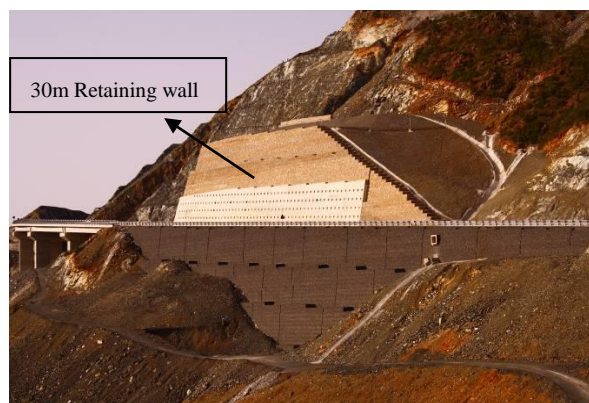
The WR6-7 wall with the upper 30 m high rockfall protection
